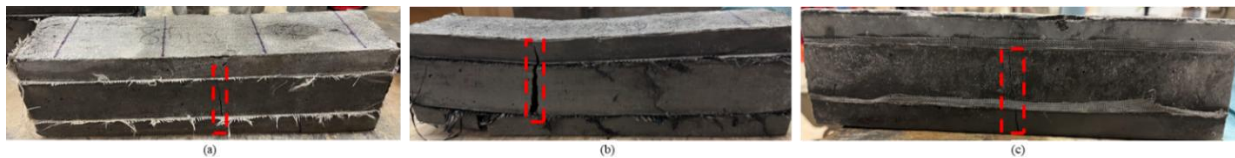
(a) 0-day exposed GFRP beam after failure, (b) 0-day exposed CFRP beam after failure, (c) 0-day exposed Steel beam after failure
